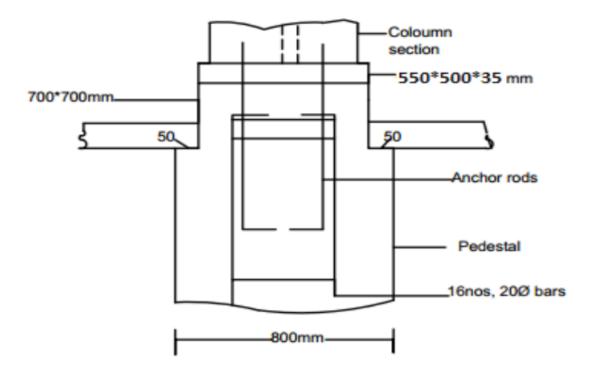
Reinforcement Details Of Foundation Of Middle Column
